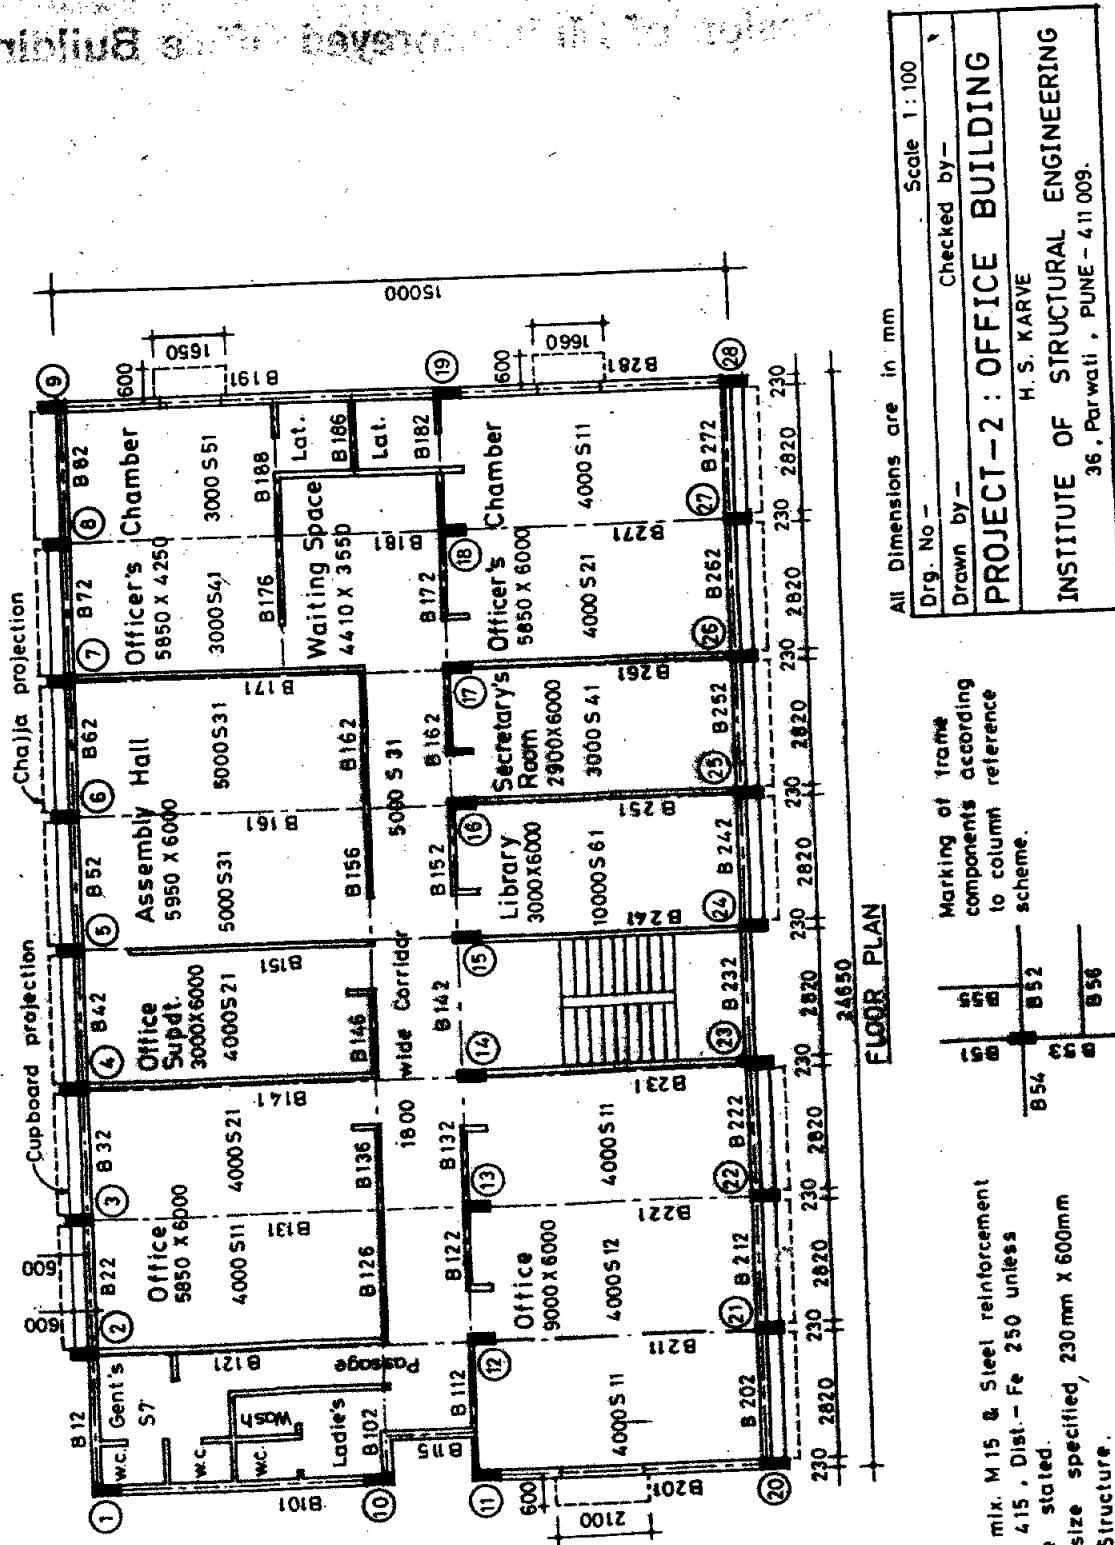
Floor Plan Of Typical Public-cum Office Building
